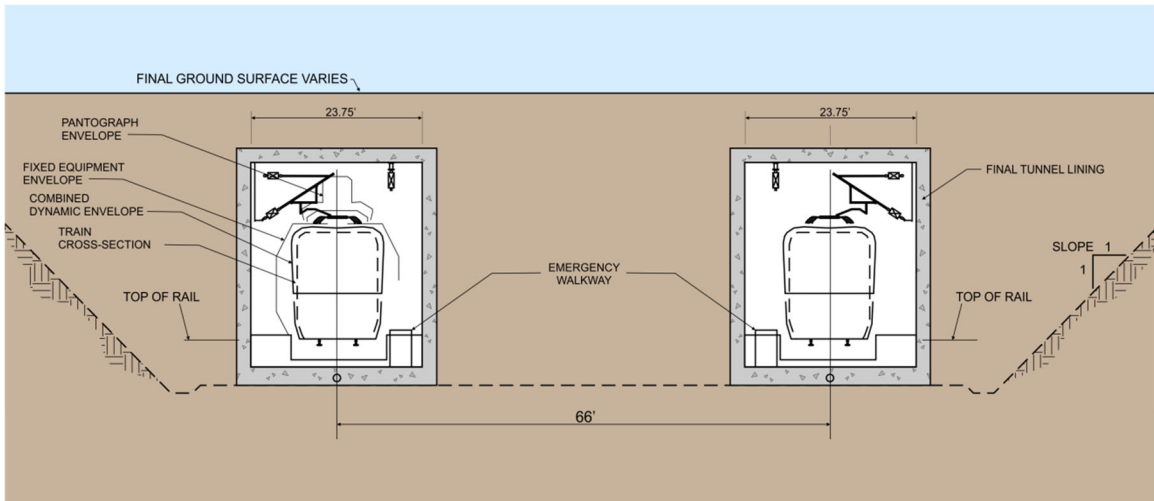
Cut-and-Cover Tunnel Typical Cross Section
